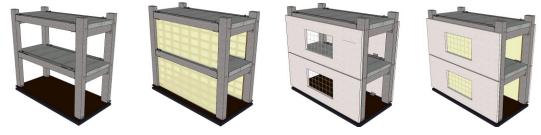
Left to right: a) Bare frame, b) frame with infills, c) frame with facades, d) integrated low-damage building
